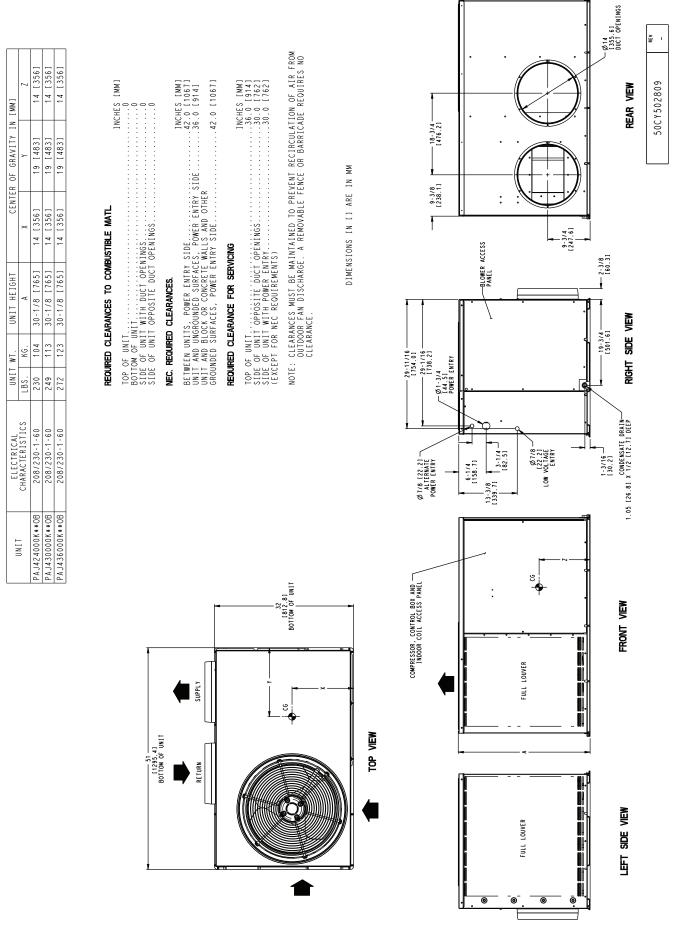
Unit Base Dimensions, PAJ4 024-036
